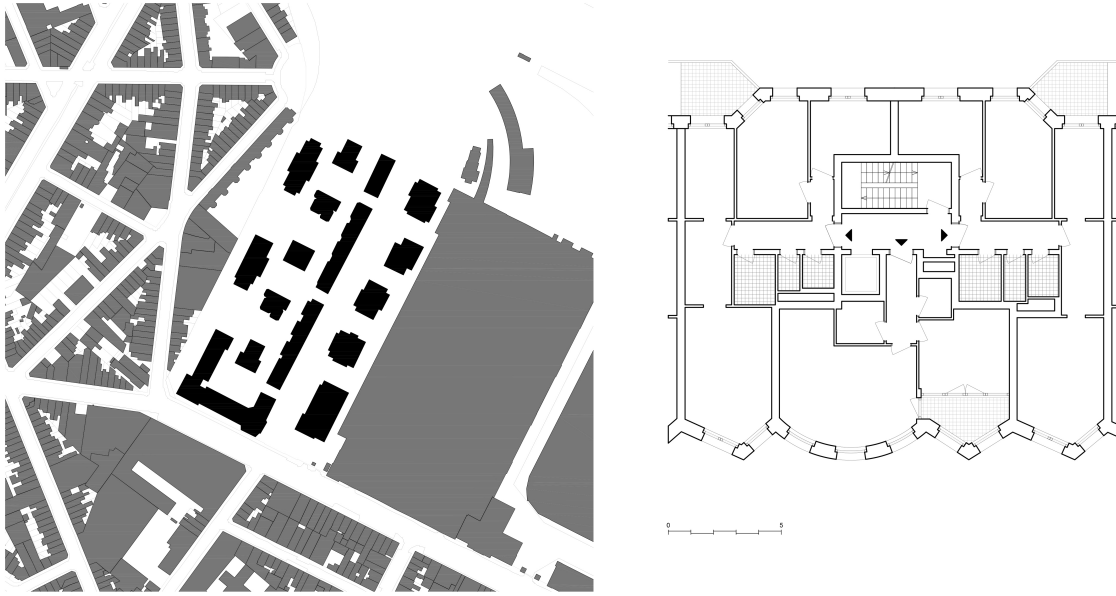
Site plan and dwelling type of the housing complex 'Havenlaan' at the Brussels Canal area (ongoing project).
